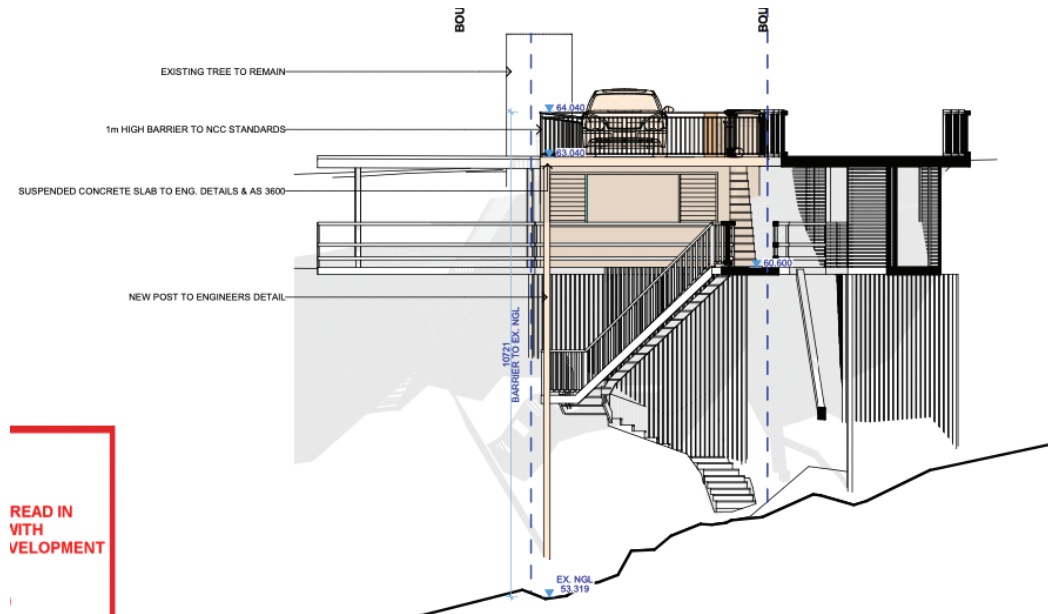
West Elevation of approved car hardstand at 135 Seaforth Crescent Source: Action Plans
